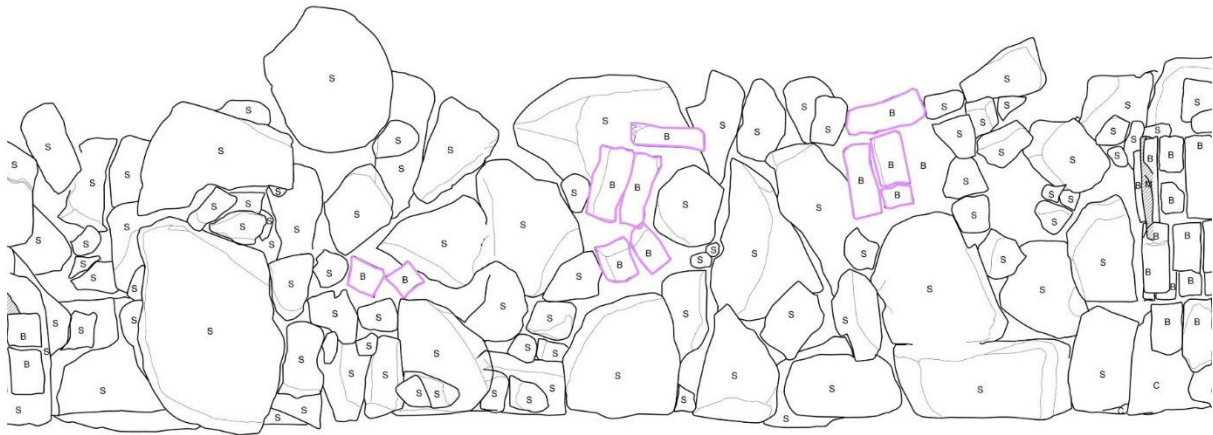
Plan of Area NA (East) showing bricks (purple colour) within stone village wall.
